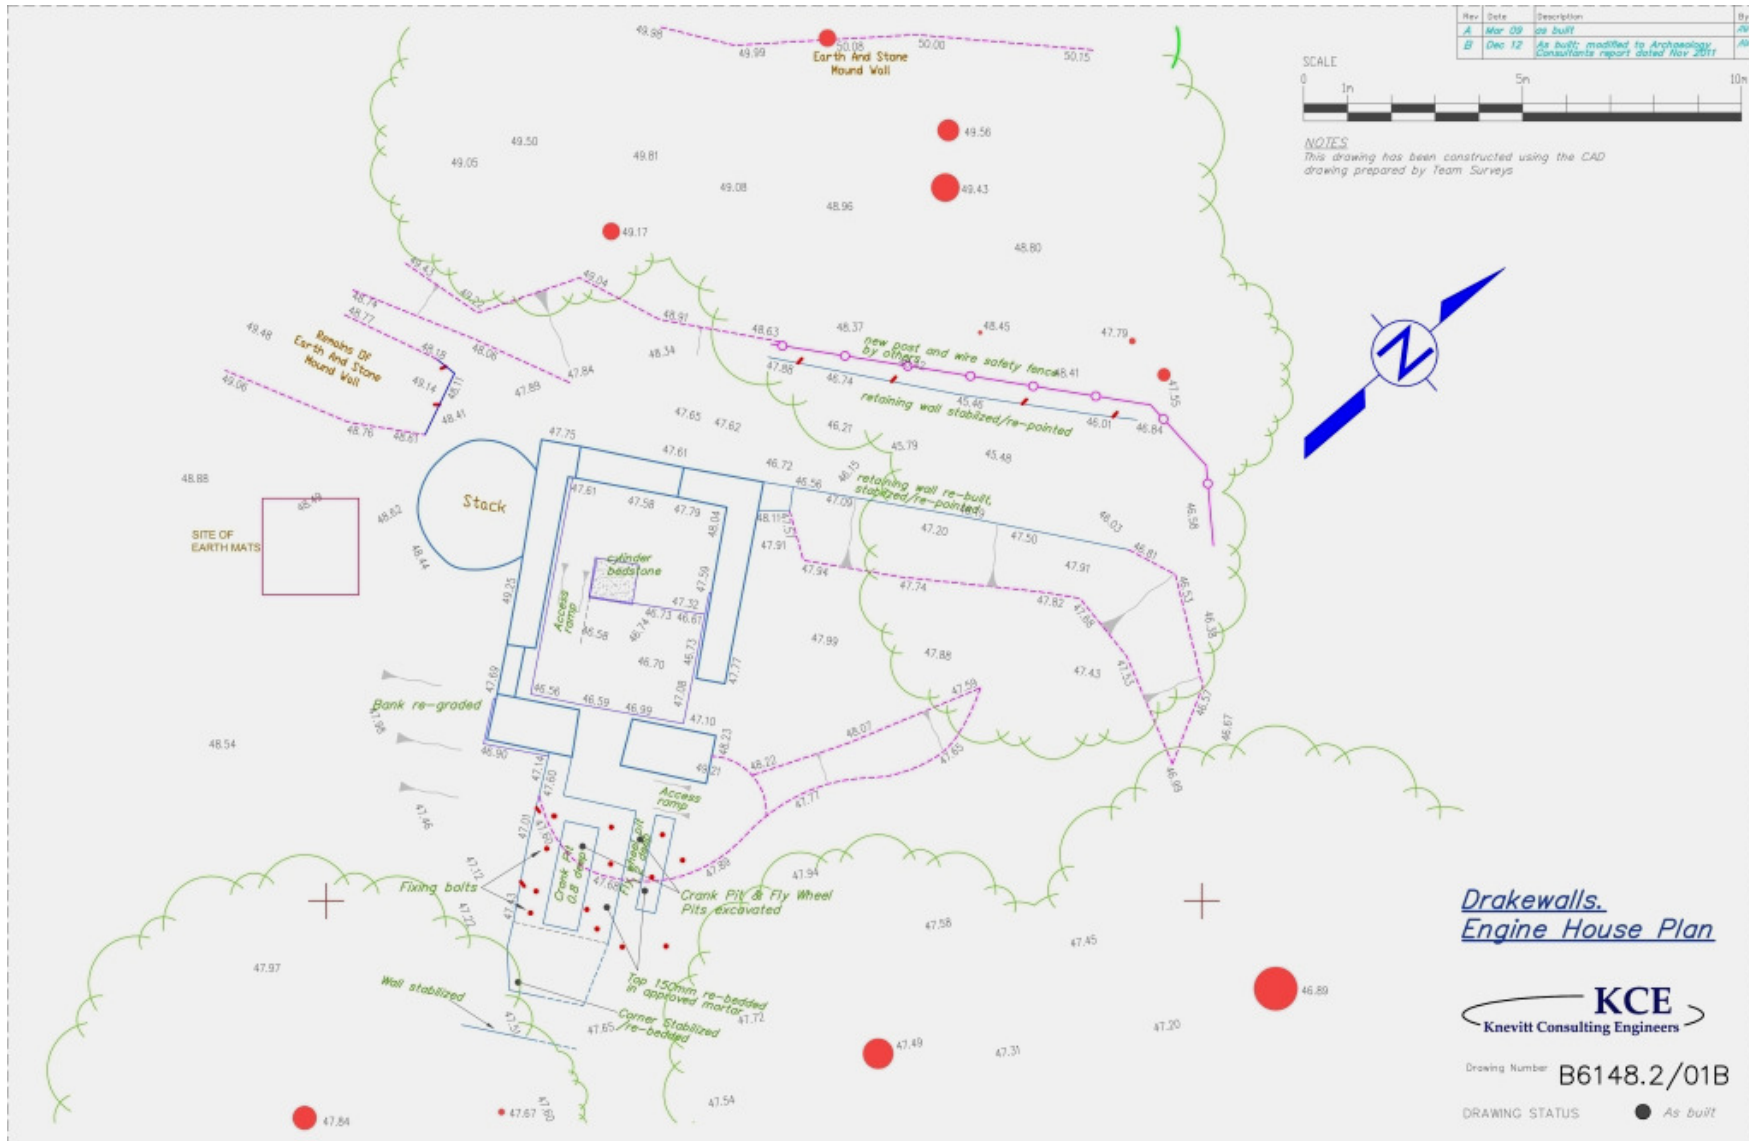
'As built' survey plan of the rotary engine (and boiler) house, flywheel loadings/crank pit after works (Knevvit Cons. Eng. 2008)
